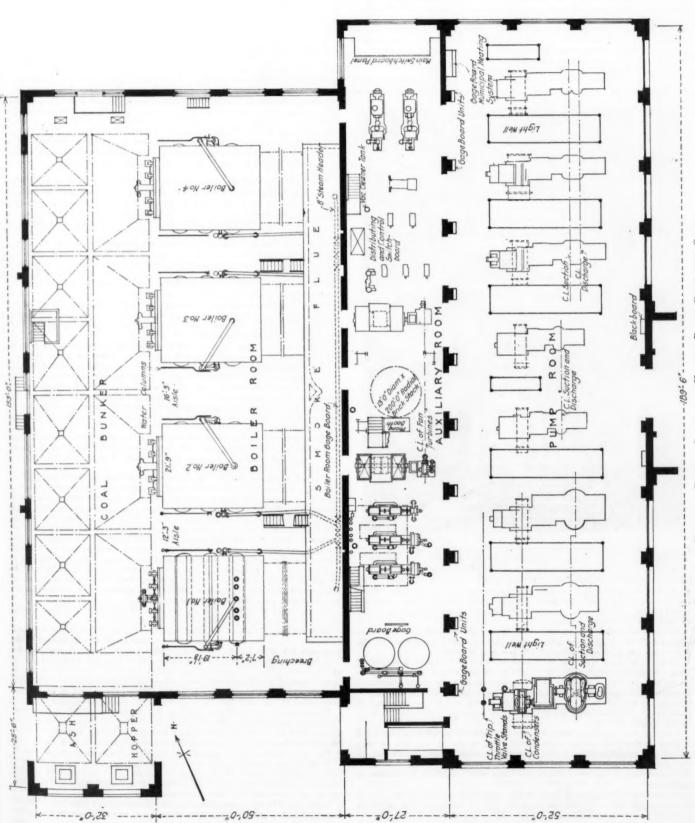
Plan of the Fairmount Pumping Station and Heating Plant, Cleveland, Ohio
